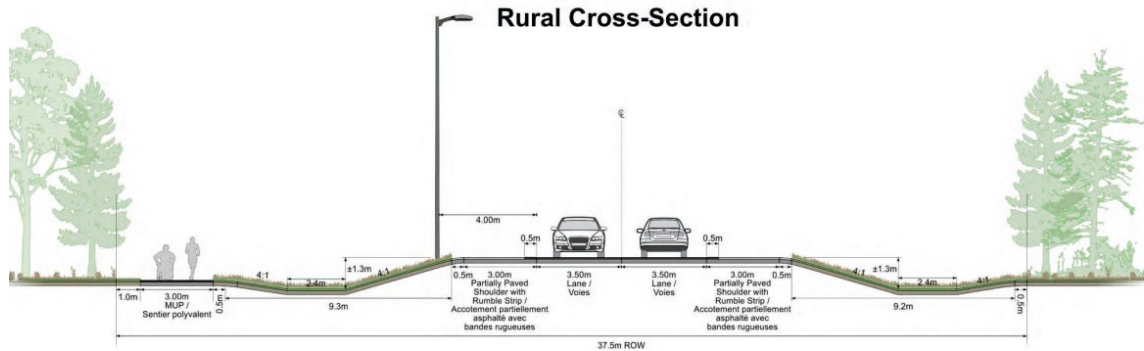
Earl Armstrong Road Extension Cross-Section: Bank Street to Hawthorne Road
